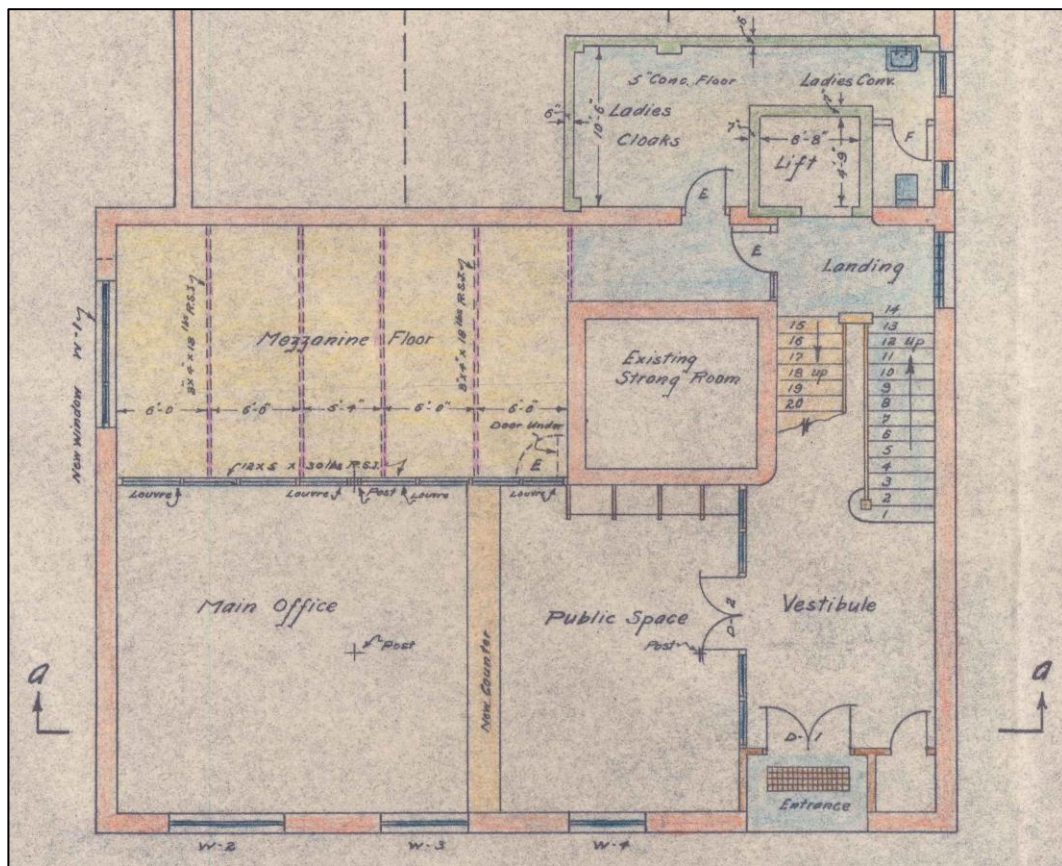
Detail of a 1957 plan showing the new staircase, lift, cloak room, and mezzanine floor (ICC Property File).
